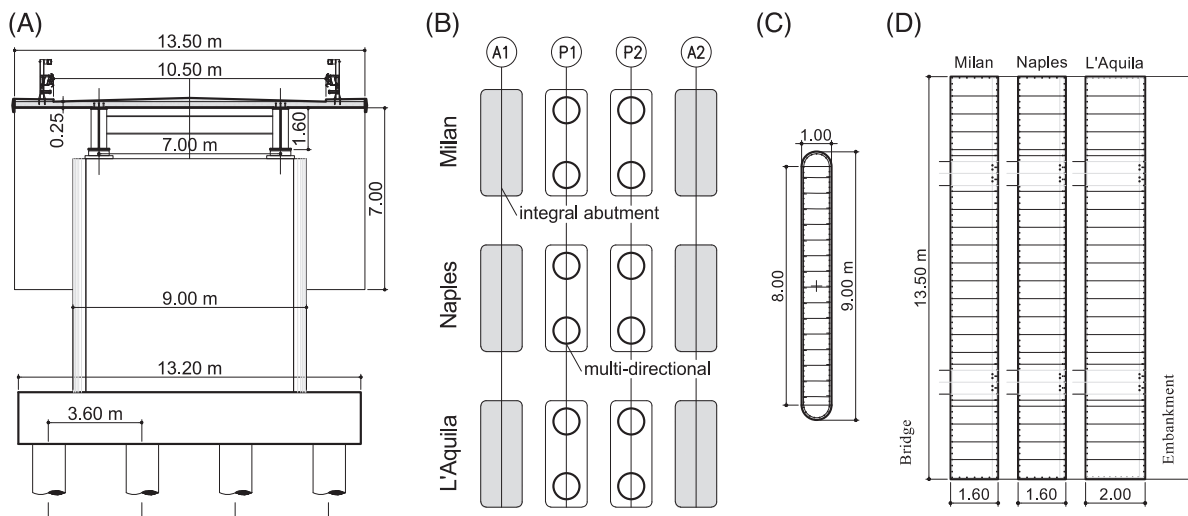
Integral abutment overpass: deck cross-section (A), bearings layout (B), pier (C) and abutment cross-section (D).
